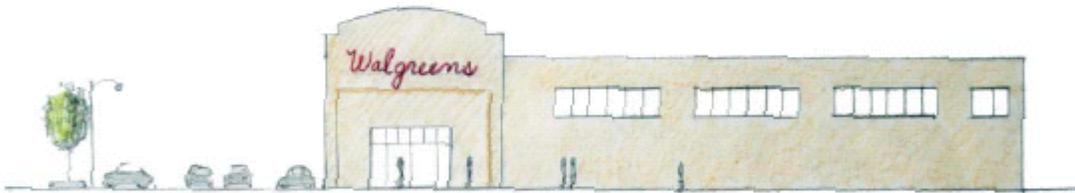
(far above) A drawing showing a typical Walgreens facade.
